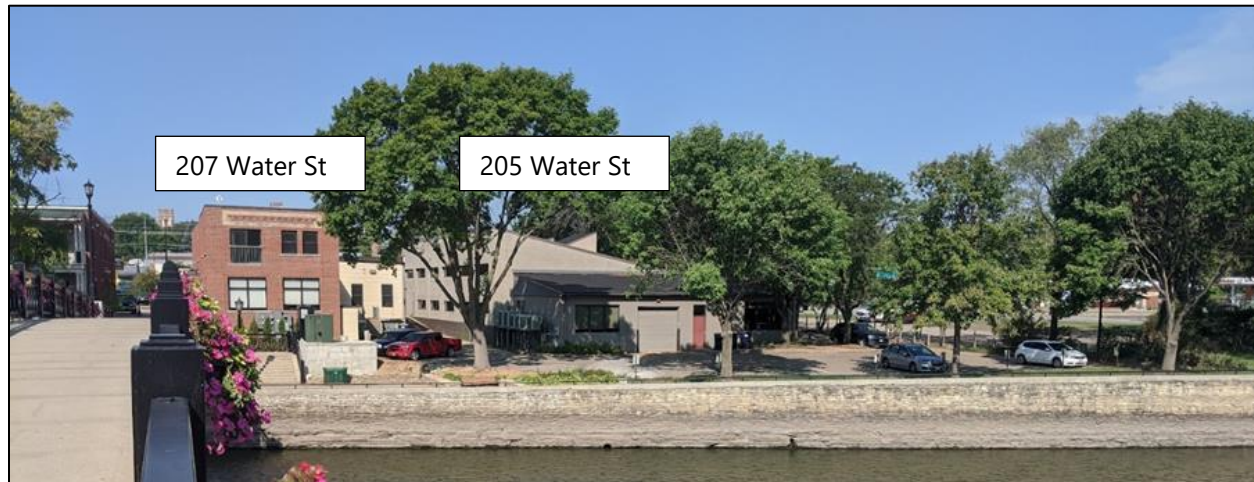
West Bank Riverwalk Properties Downstream of Pedestrian Bridge
